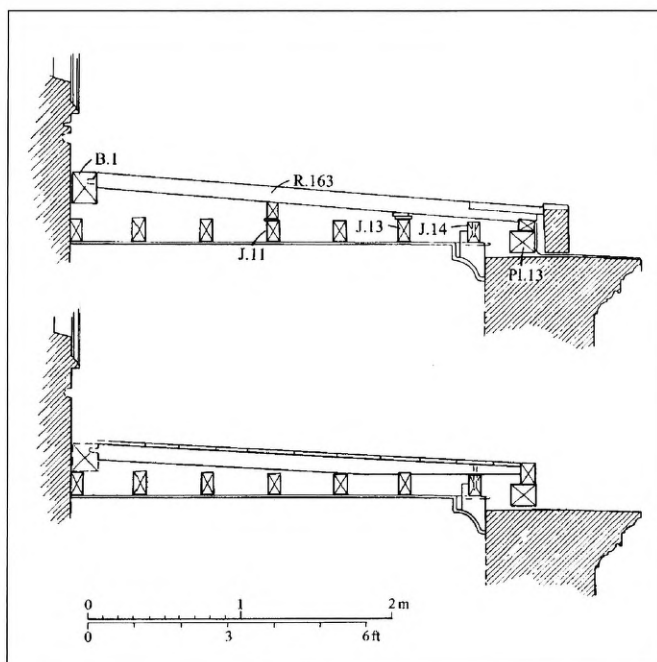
Section of south aisle roof: as found (above) and as built (below).
